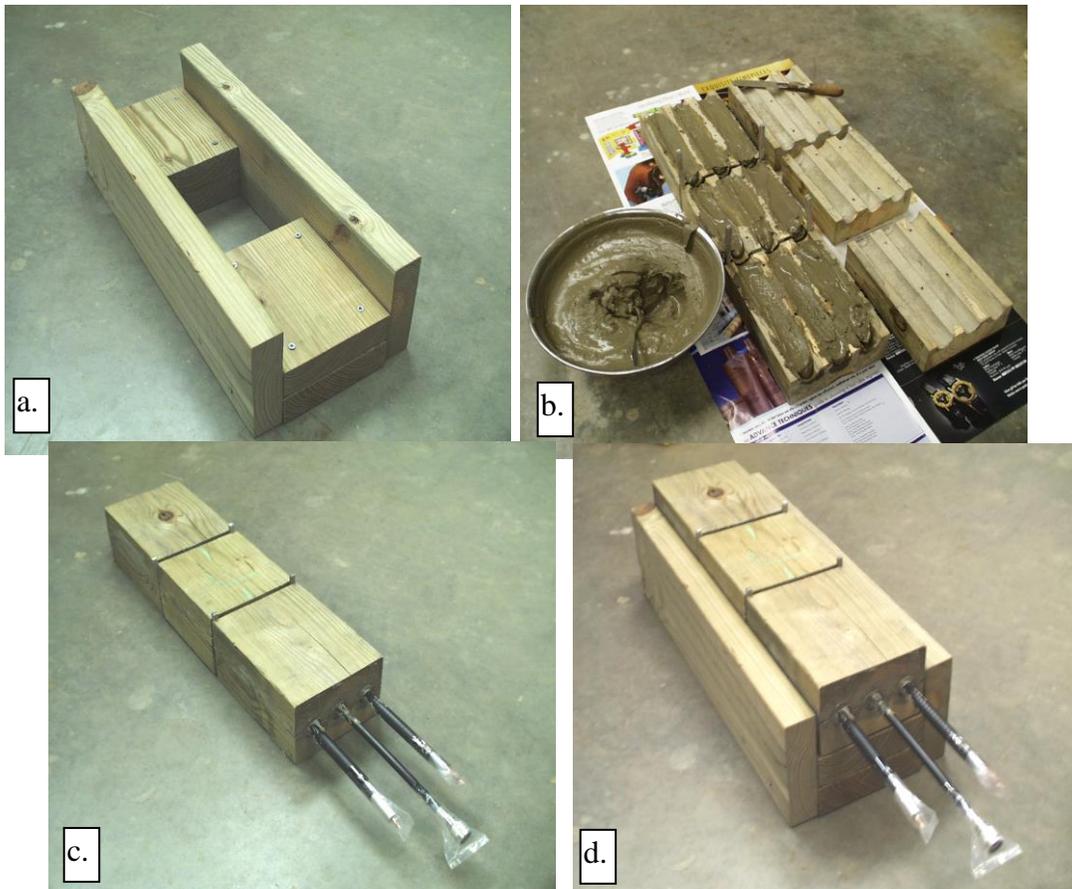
Wooden mold used for laboratory testing of cables. (a) Mold base, (b) Split mold with grout, (c) Assembled split mold, (d) Assembled double shear device.
